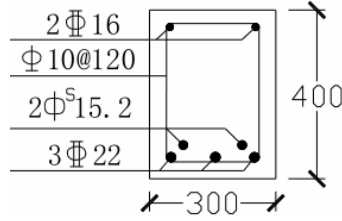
Reinforcement diagram of concrete beam cross-section size
